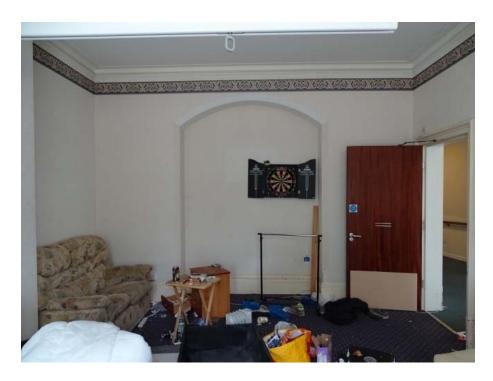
Room 4 at ground floor of the House looking east toward blind arch feature
